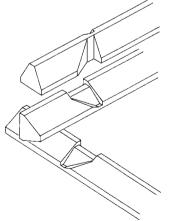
Treasure house of the Todai-ji in Nara Detail of log construction joint
